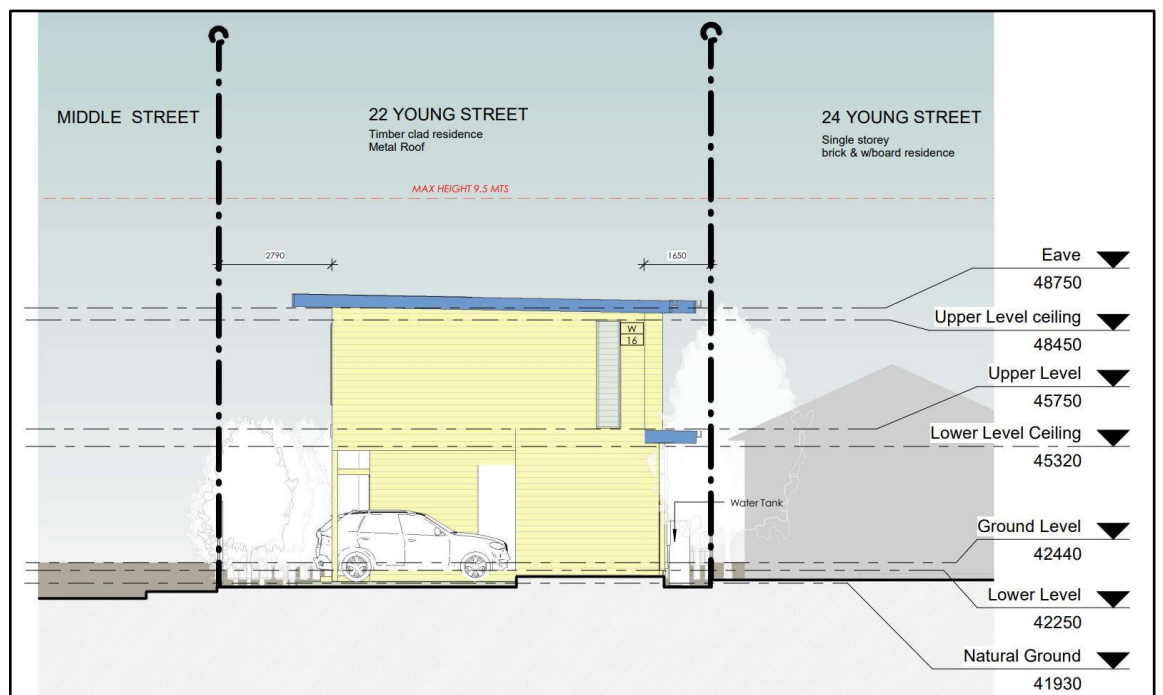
Proposed West Elevation. (Source: Bentley Design)
